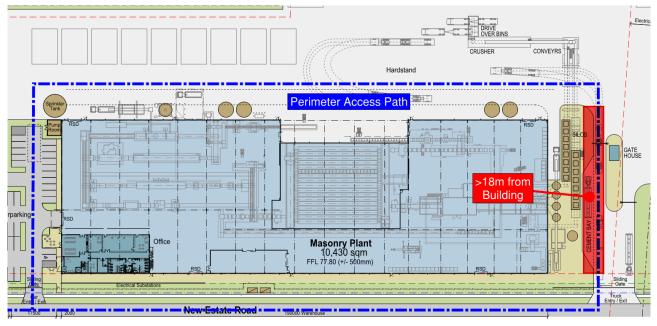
Vehicular Perimeter Access Path – Masonry Plant
